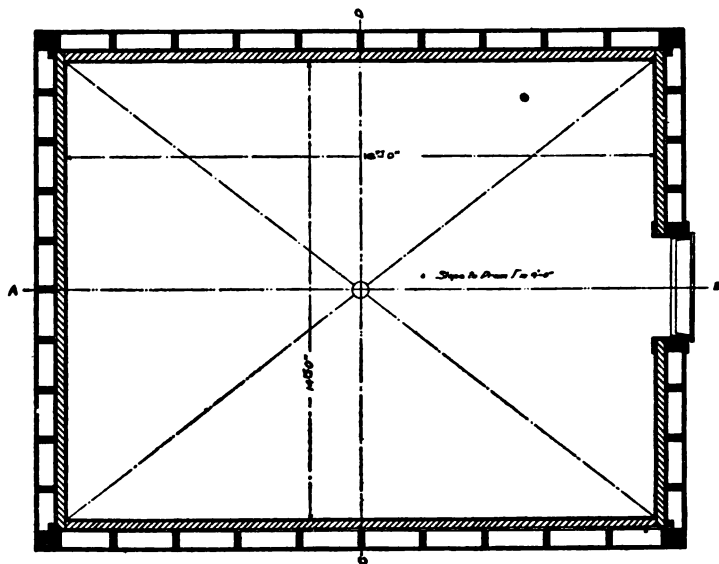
Framed ice house with commercial insulation. (Ground plan.)
